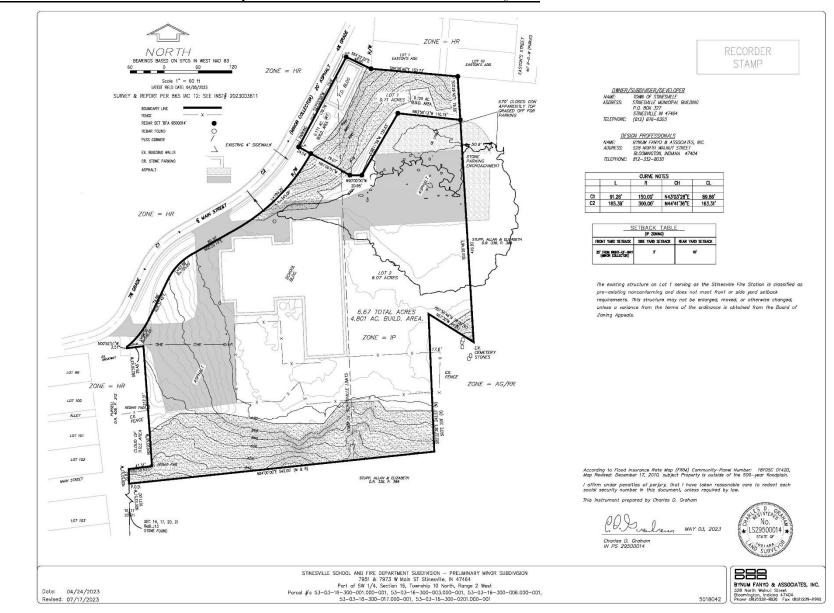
Stinesville School and Fire Department Minor Subdivision – Preliminary Plat
